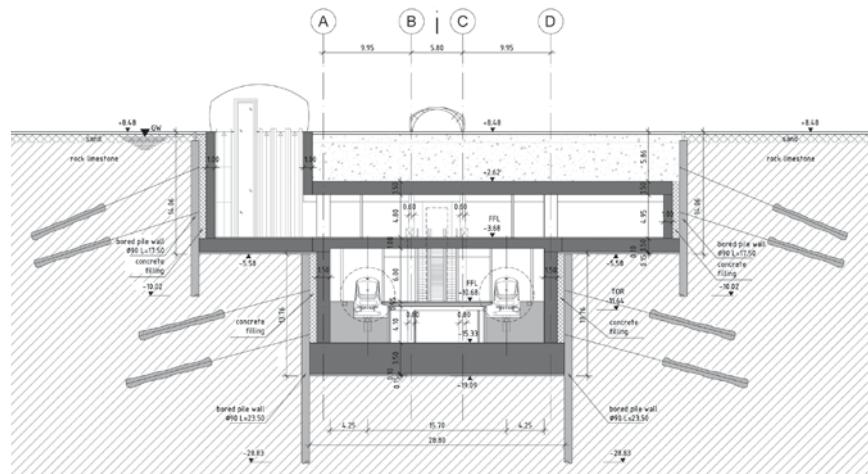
, A typical station of this line is the so-called 'Silver I-Type underground station' with a central platform (120 m length, 15.70 m platform width, < 10,000 passengers/d) with a track system of around 17 m underneath the surface.
